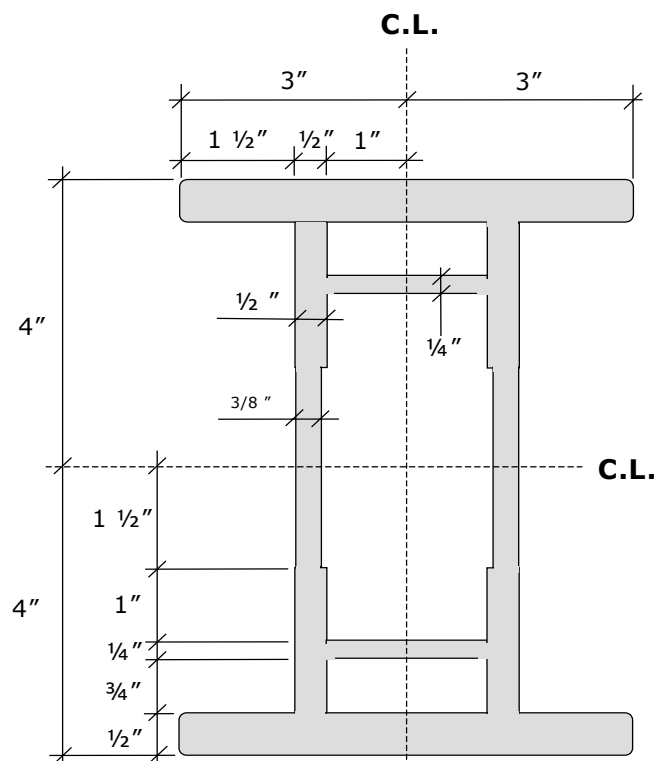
FRP Hybrid Girders Laid Sideways.
